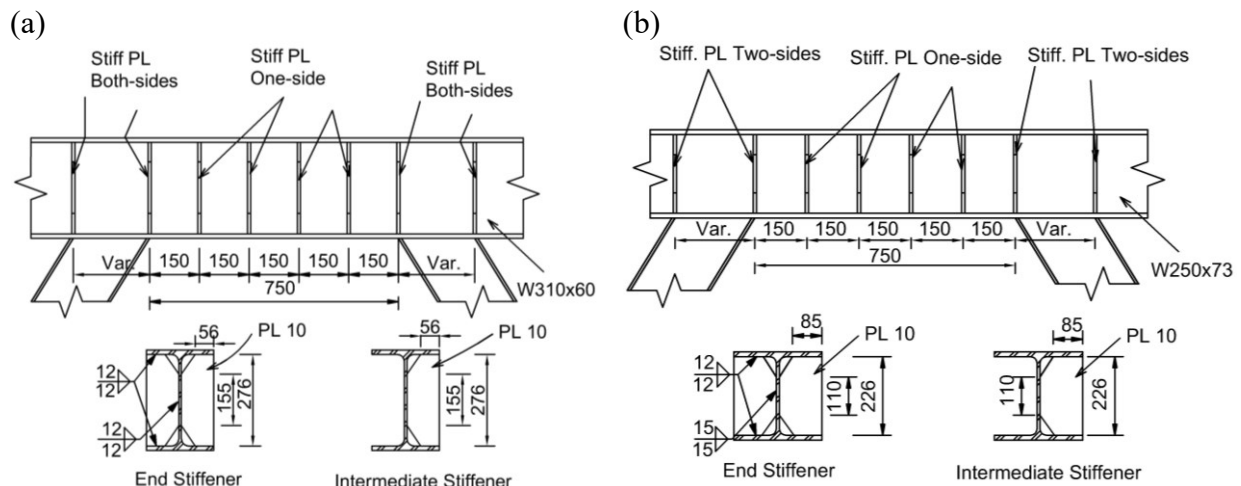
Link stiffeners: (a) Specimens 1; (b) Specimen 2 (dimensions in mm).
